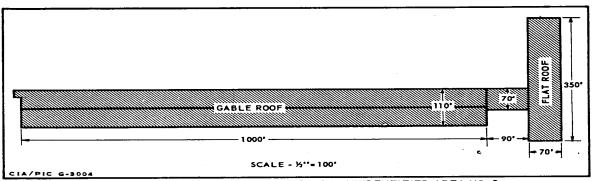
LONG MULTISTORY BUILDING IN UNIDENTIFIED AREA NO. 2.
